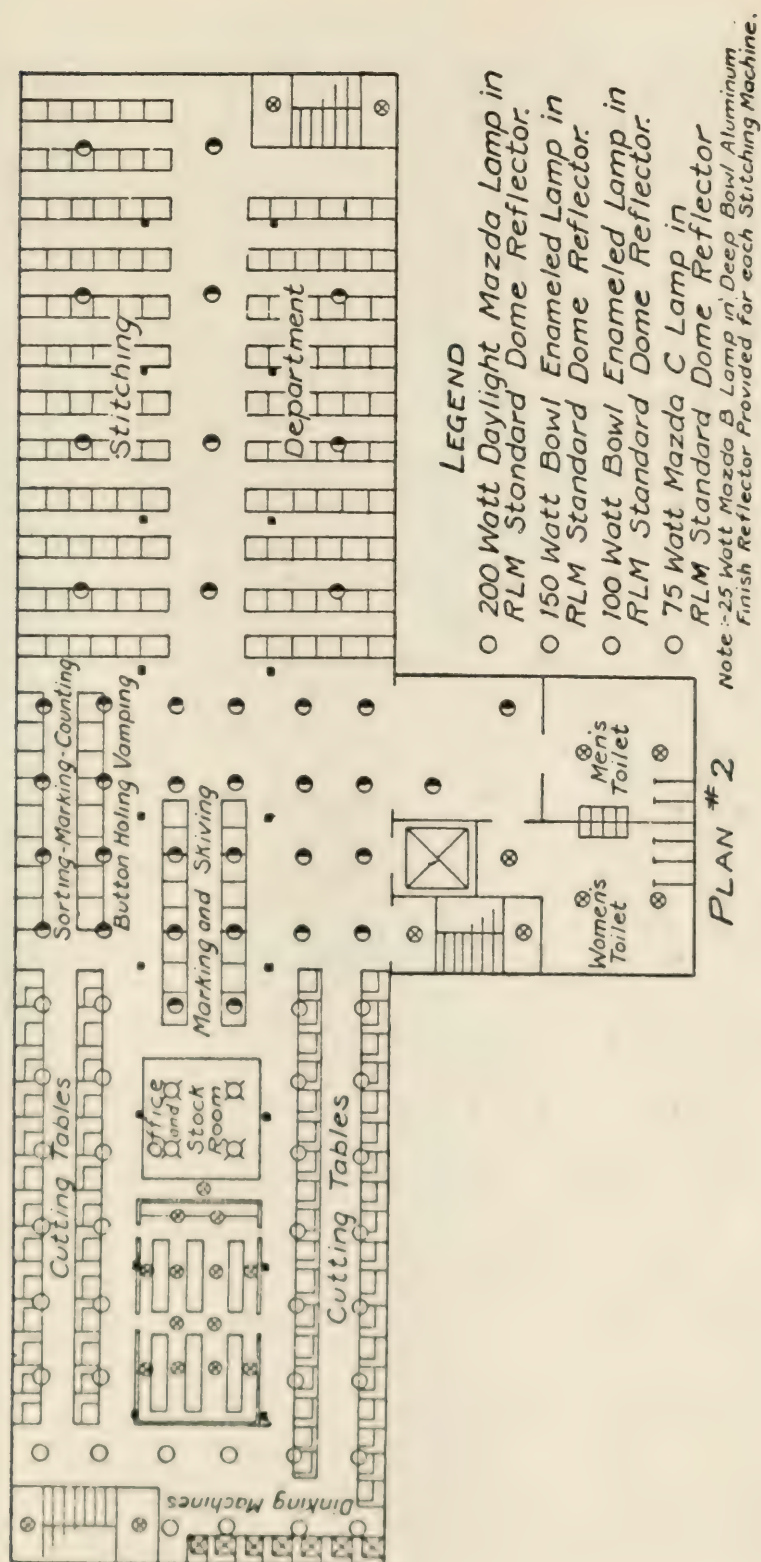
Model shoe factory, fourth floor plan, upper leather department, cutting and stitching.
